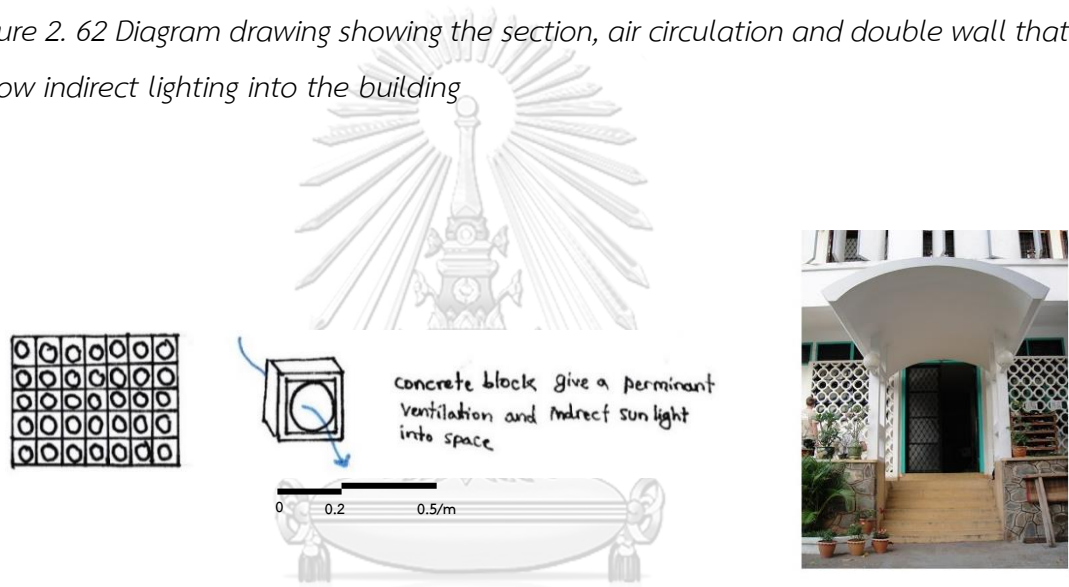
63 Detail drawing of the concrete ventilation block of the building. (source; Vann Molyvann project)
